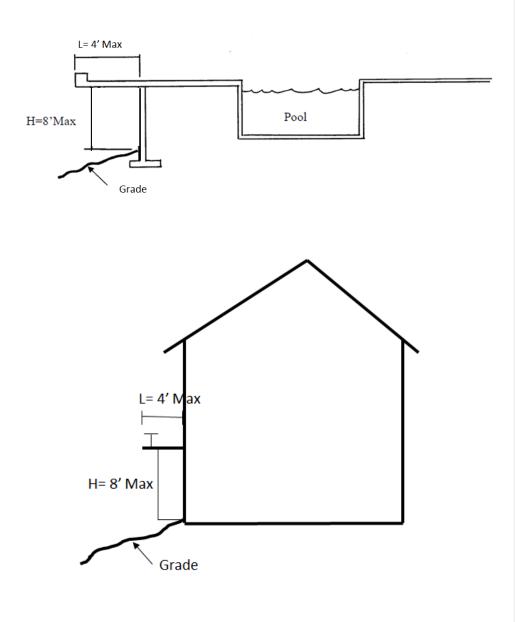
HEIGHT FOR A CANTILEVERED ELEMENT
